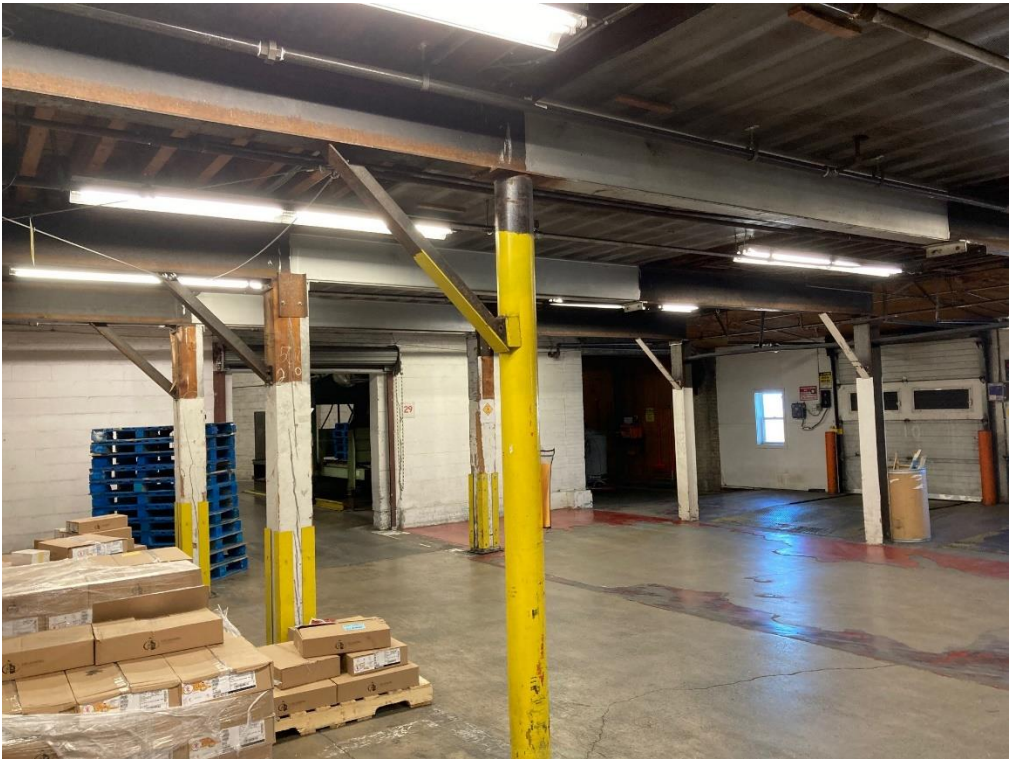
Label Room Building. Original warehouse and rail car unloading dock. The wood and steel framed structure has closely spaced columns that limit building reuse options.
